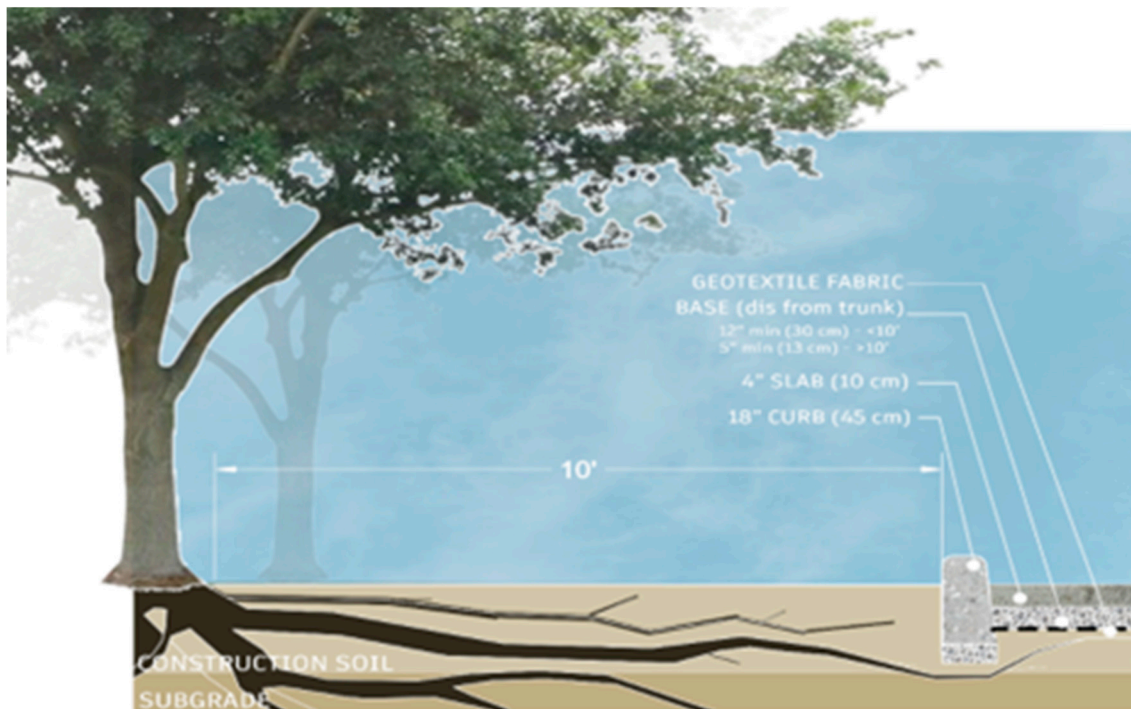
Design schematic of root-soil-pavement system for tree placement 3 m away from tree base.
